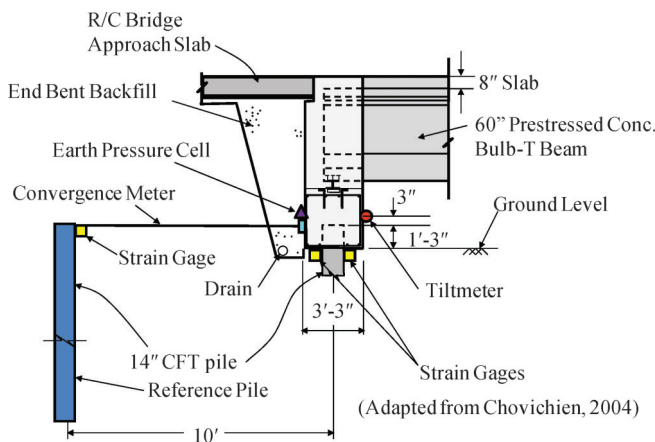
Elevation View of SR-18 Abutment Instrumentation
